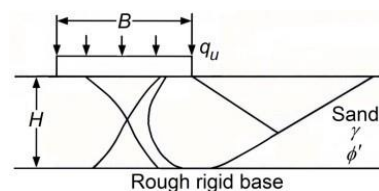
Failure surface in a granular soil of limited thickness supporting a surface strip foundation.
